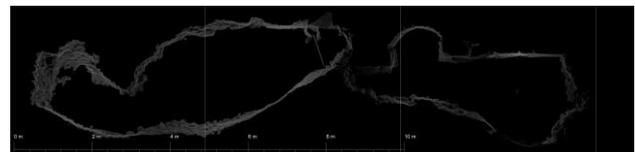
West-east cross-section of the north casemate showing the collapsed ceiling.
